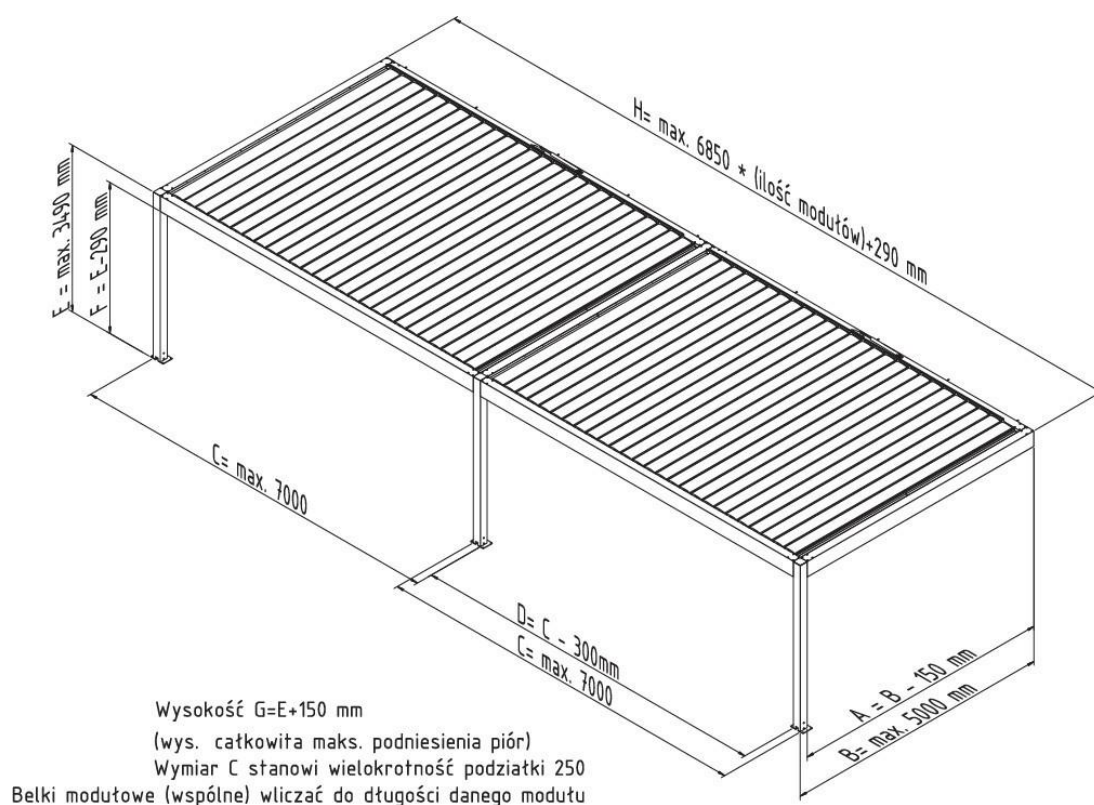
Pergola SB500 modular longitudinal wall-mounted (pass through wall fixing through the beam).
